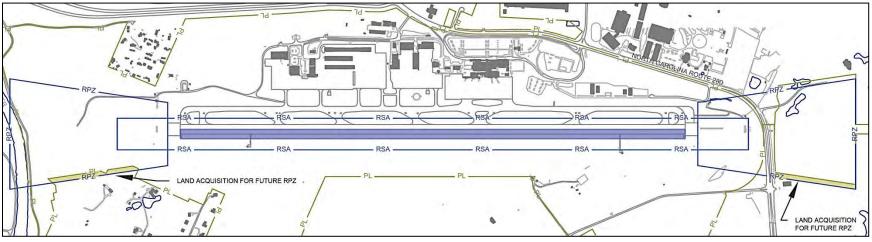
Alternative 1 – Relocate Runway 75 Feet to West
